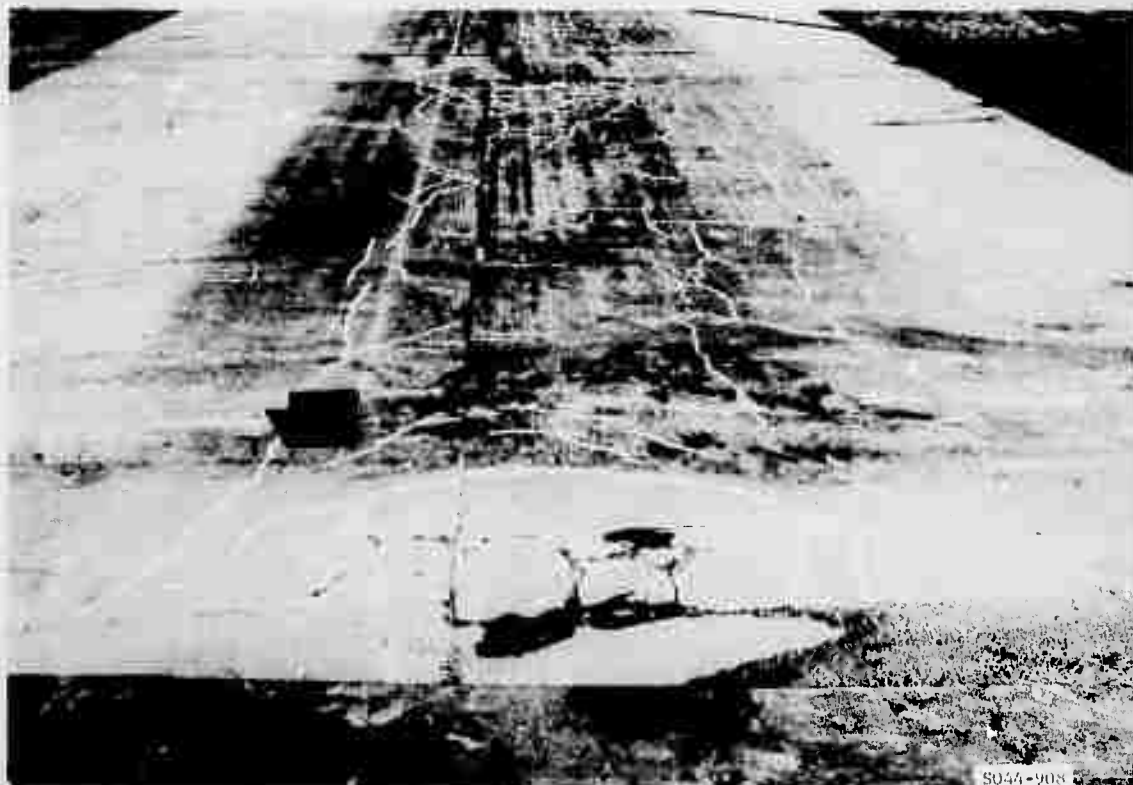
Item 1, lane 1, rigid pavement test section, after 1770 coverages by 200-kip twin-tandem assembly
